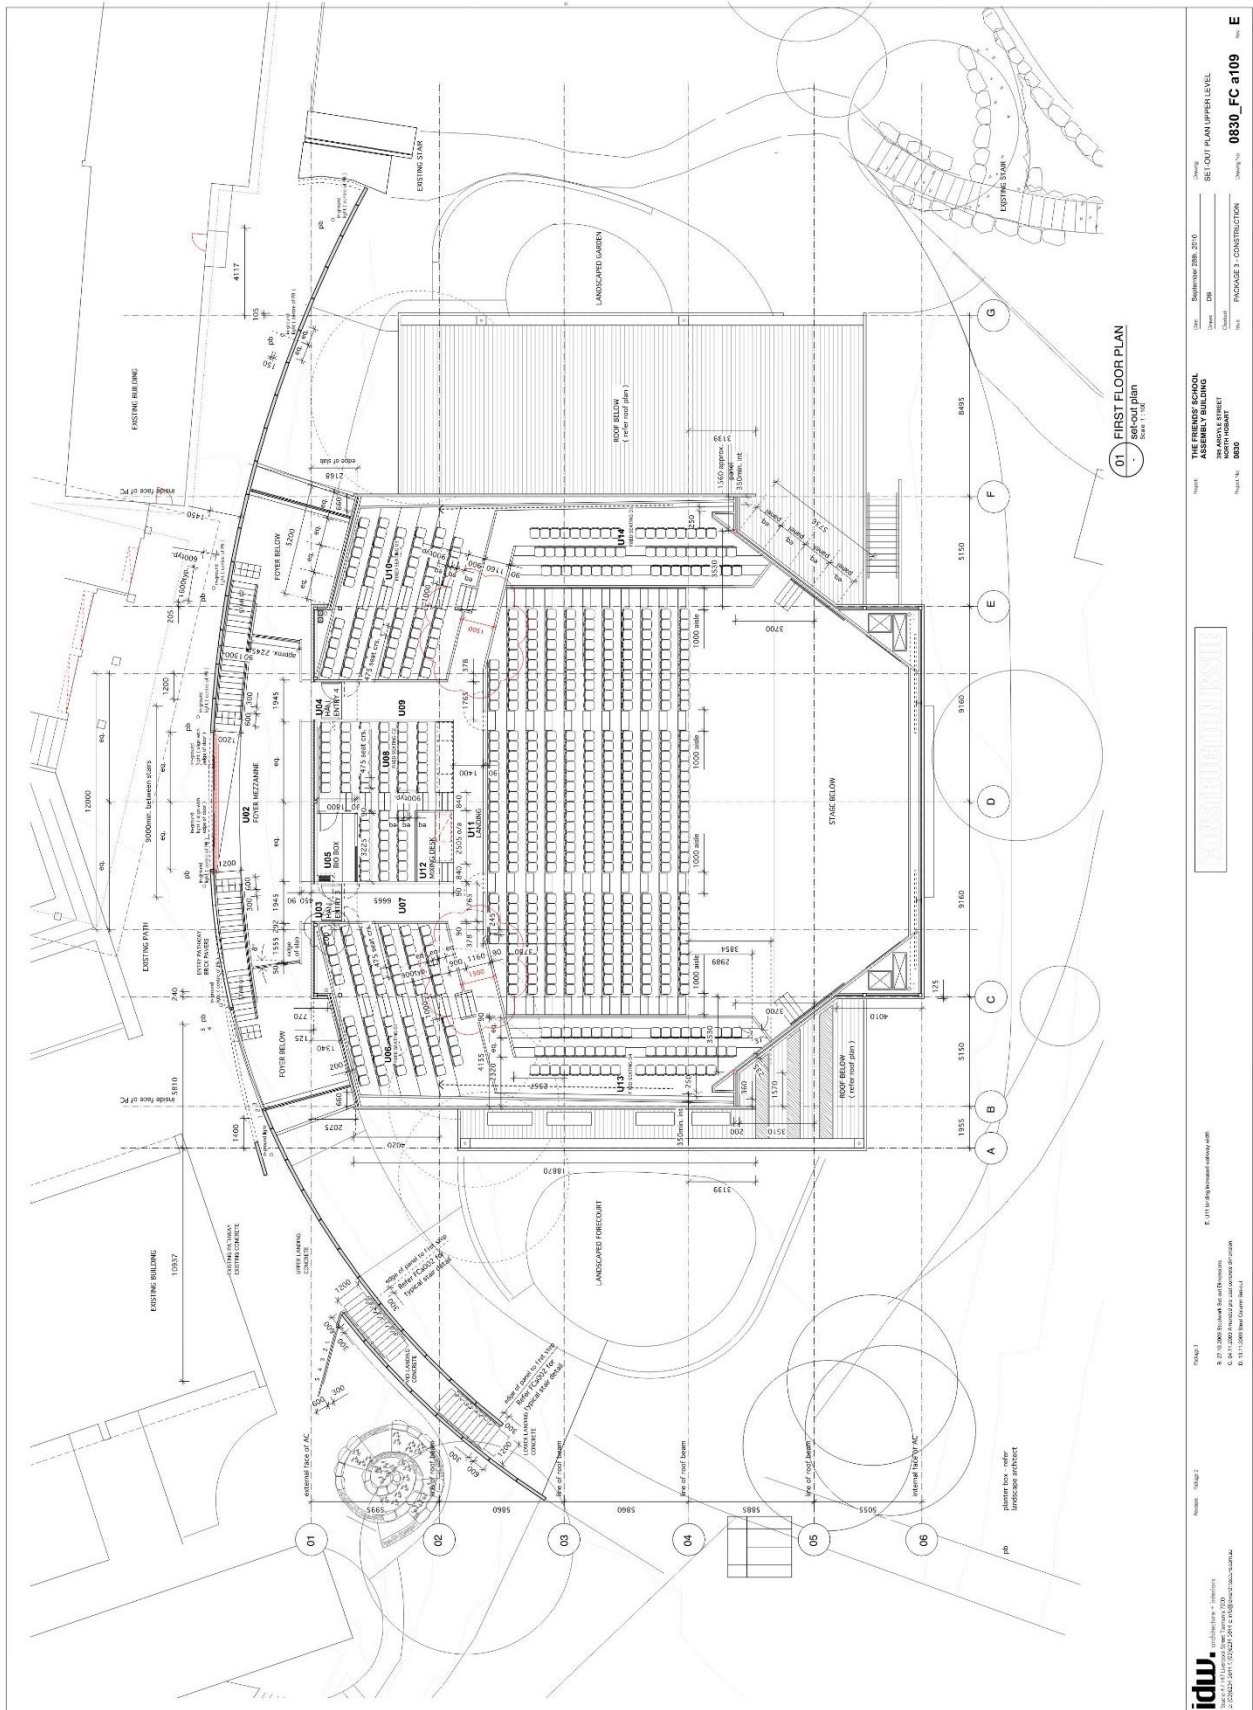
The Farrall Centre – Set-out Plan Upper Level
